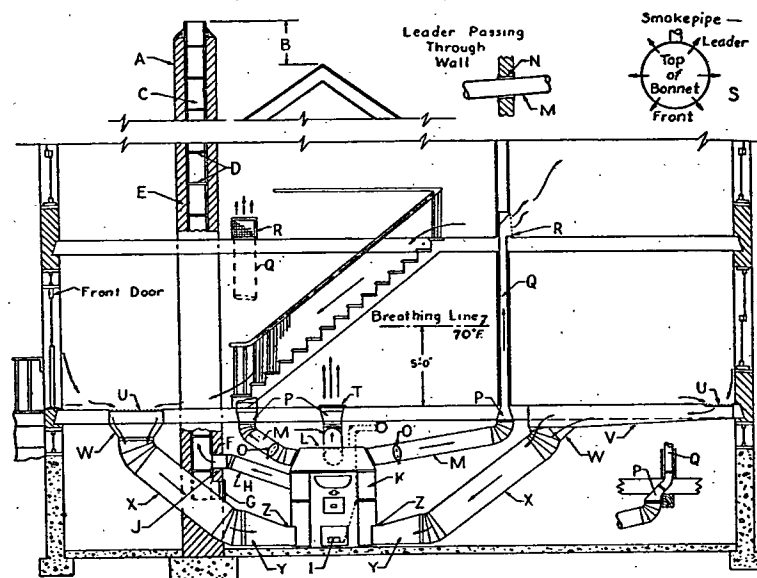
A SECTIONAL VIEW OF A TYPICAL PLANT SHOWING GOOD INSTALLATION PRACTICES
